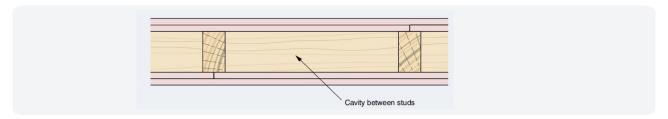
Typical direct fix fire-protective covering applied to timber stud wall.
